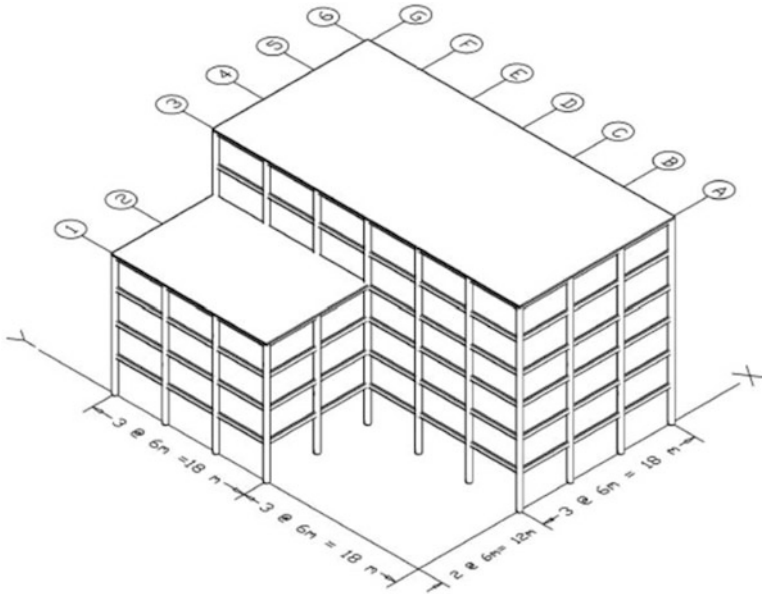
Isometric view and in-plan dimensions of the building structure
